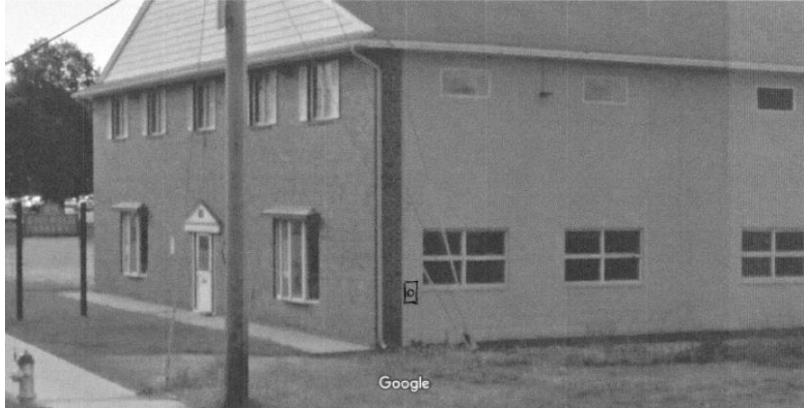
An image submitted by the applicant showing the location of the Rapid Shutdown Switch along the eastern façade of the building located at 85 Emerald Street.
